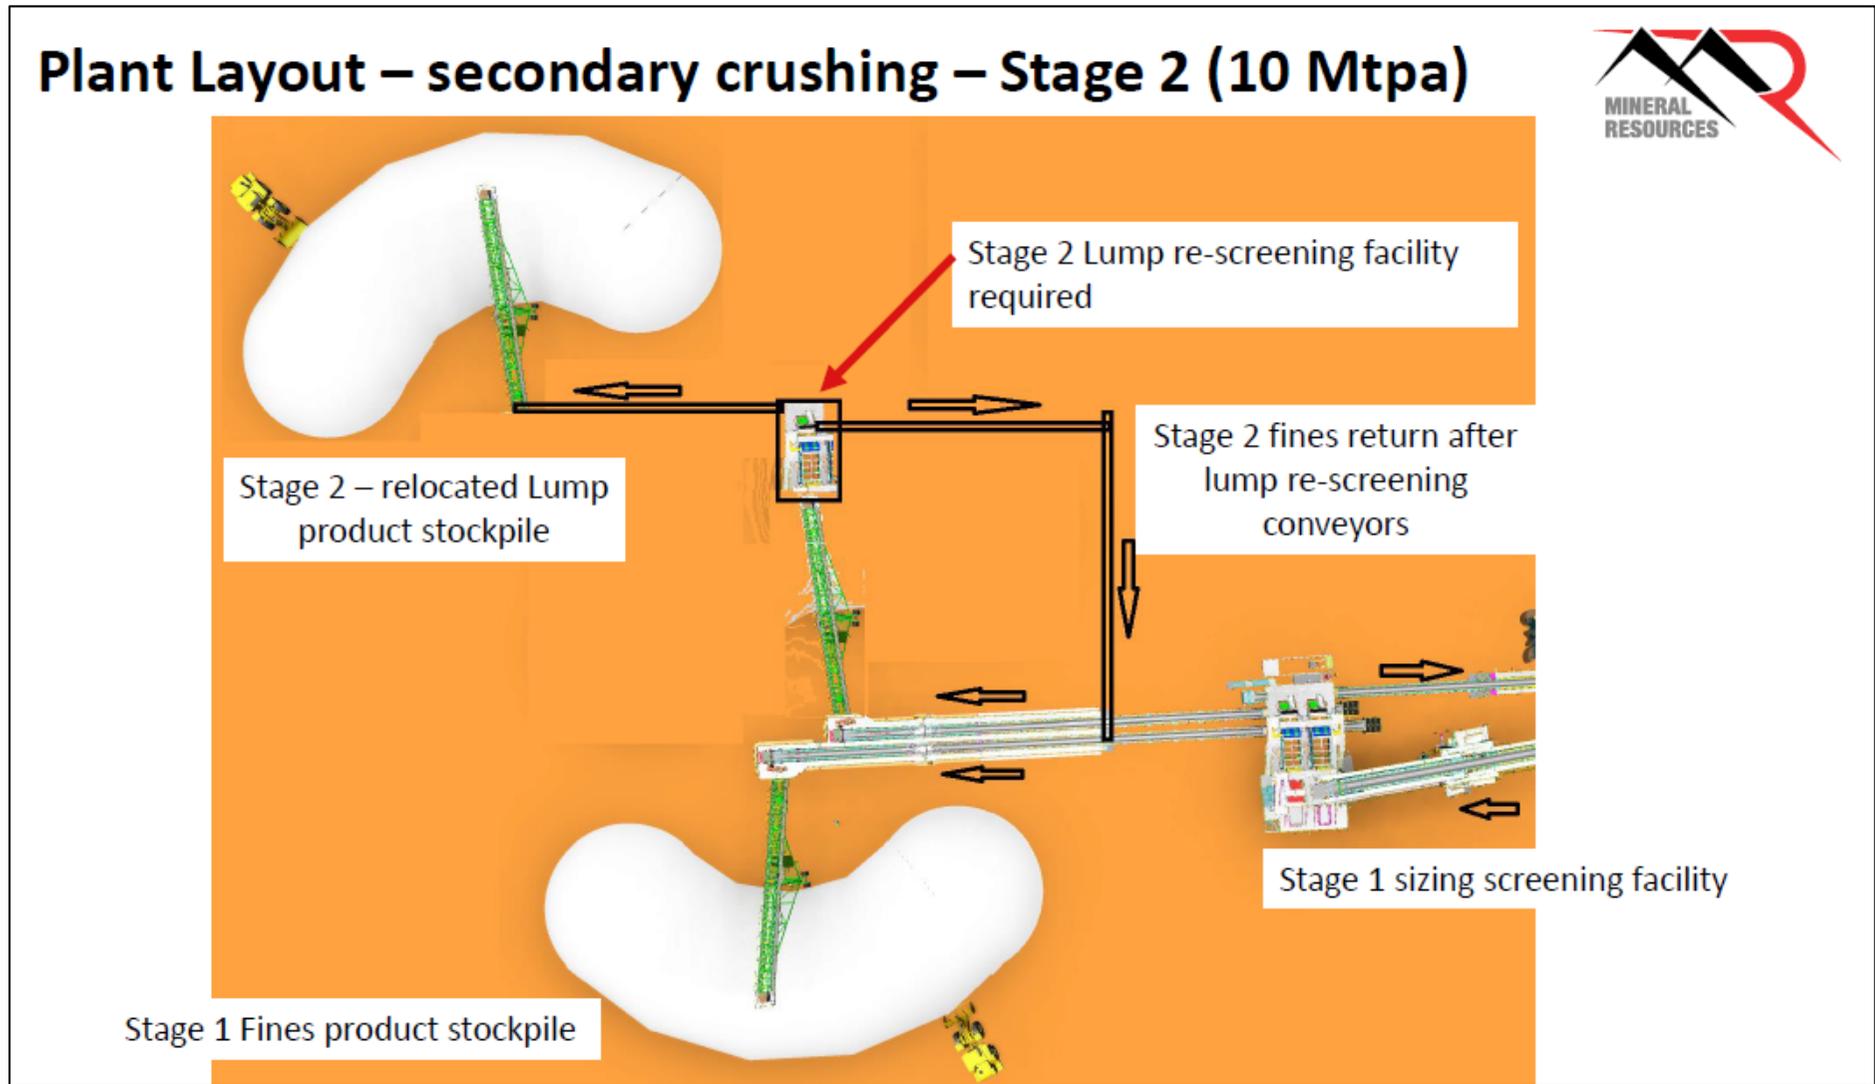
SITE LAYOUT - OHP LAYOUT (W6358)
